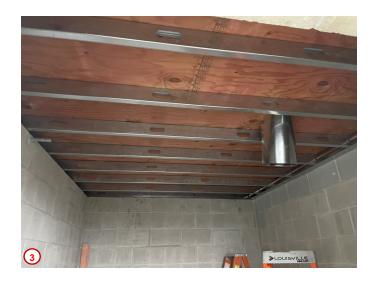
shows that the framing and wood decking has been completed for the hard ceiling in the new janitor's closet in the basement. Once the electrical and mechanical infrastructure is in place the wallboard can be installed.
